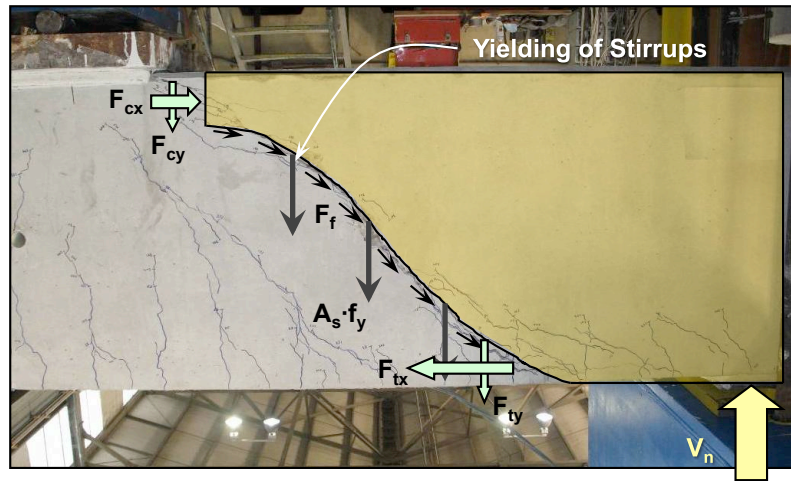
Sectional or two-panel shear failure ($a/d = 2.5$).
